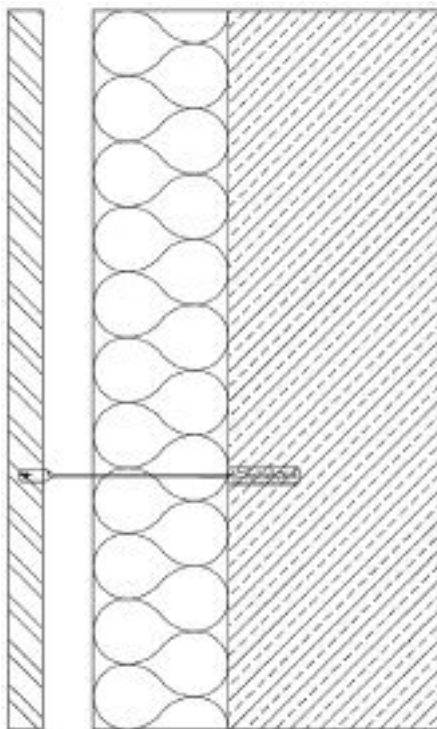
Cross-section of a back-ventilated natural stone façade
